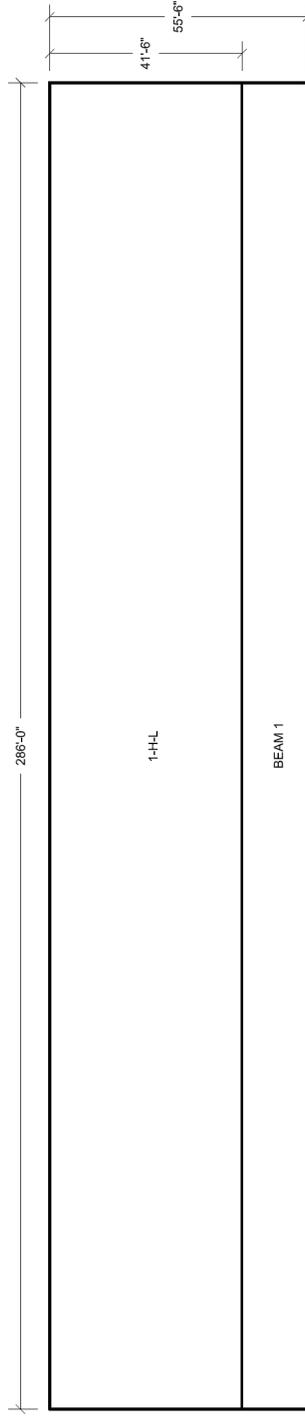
H.6-108: COOLING TOWER NORTH (AND SOUTH) WALL LOOKING SOUTH (NORTH),
